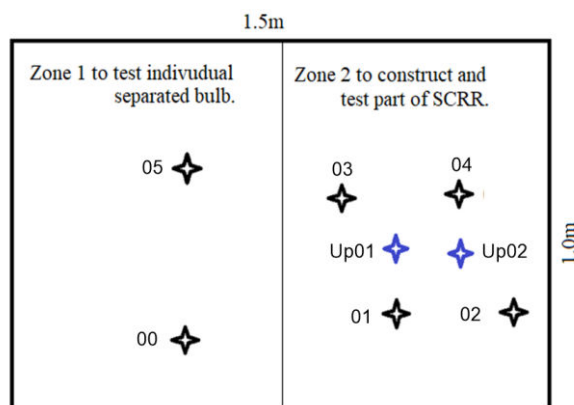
Site plan showing the site dimensions and bulb locations (Not in Scale).
